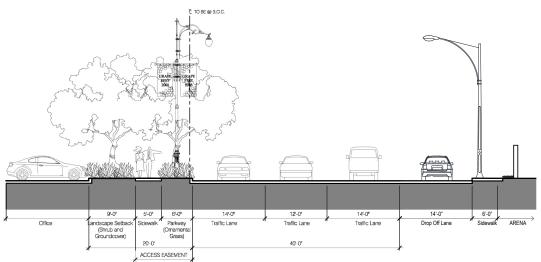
Fourth Street at Retail Center Public Streetscape Section and Plan
